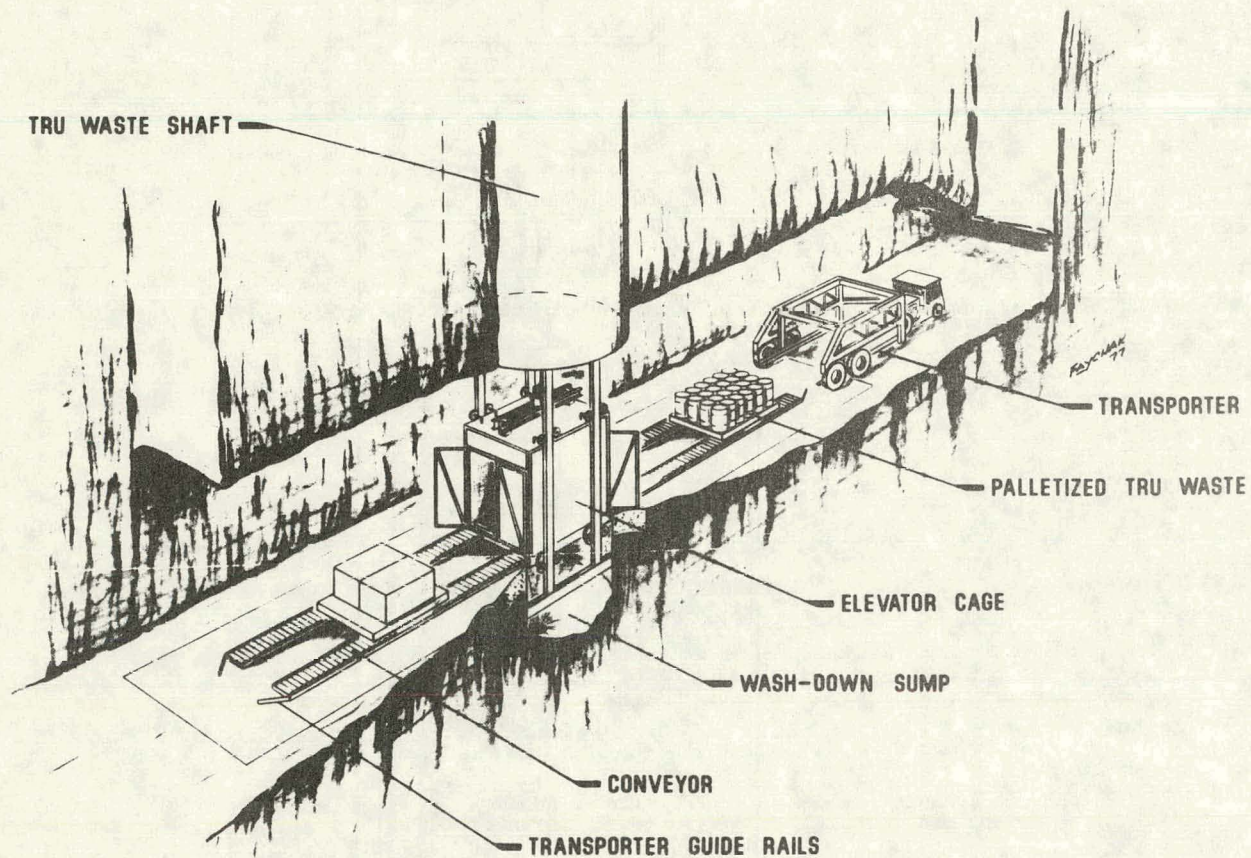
WIPP underground TRU waste receiving station
